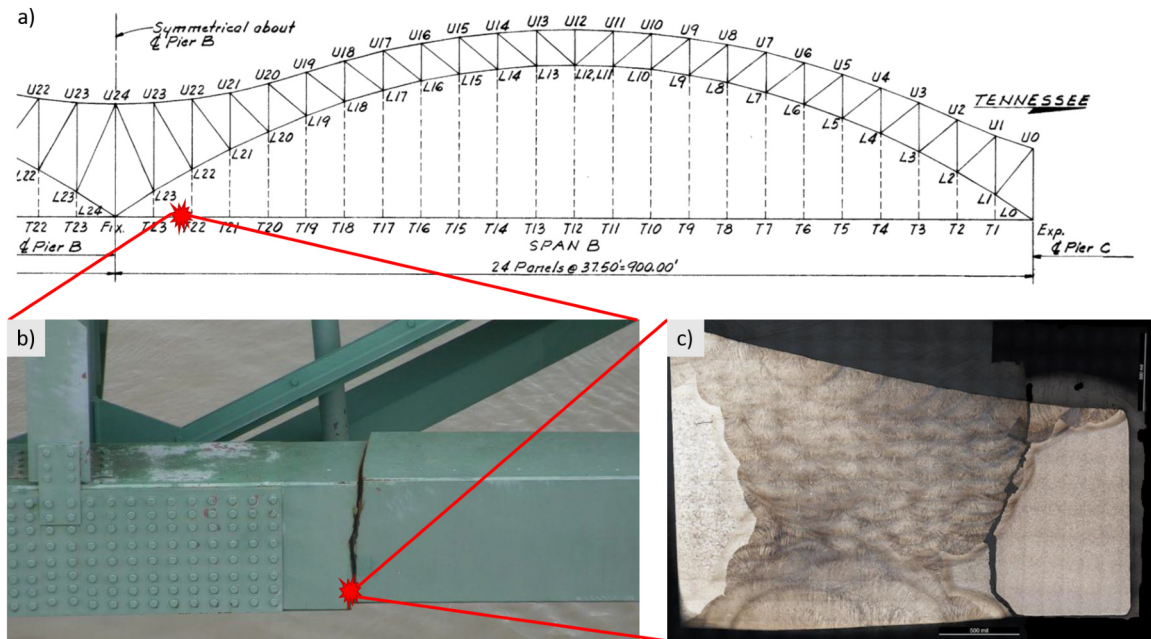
Fracture in the tie girder of the Hernando de Soto Bridge showing the fracture from macro to micro scale; a) overview of the Hernando de Soto Bridge east span arch; b) photo of the fracture in the tie girder; c) micrograph of the area where the crack progress started; adapted from [5]
